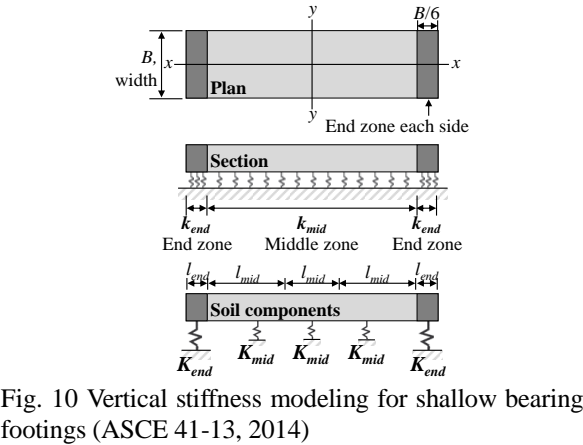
Vertical stiffness modeling for shallow bearing footings (ASCE 41-13, 2014)
